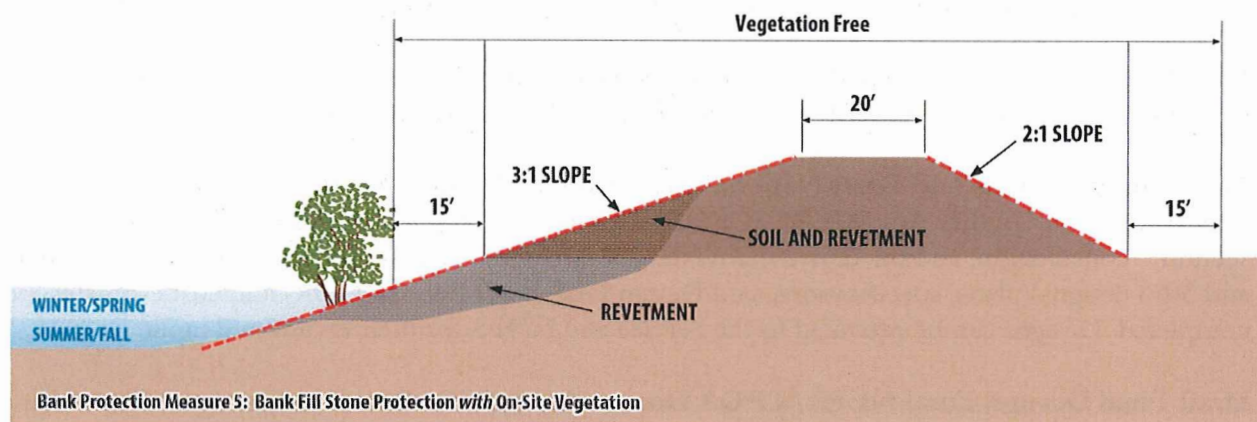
Bank Protection Measure 5: Bank Fill Stone Protection with On-Site Vegetation
